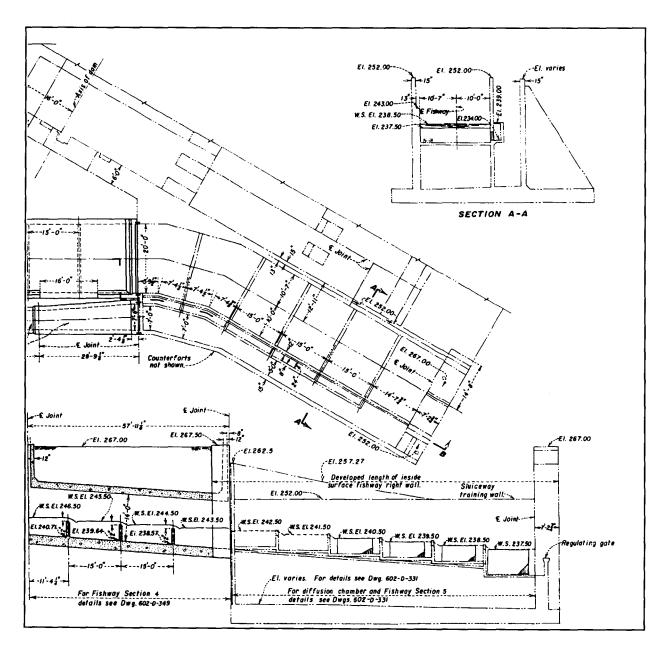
Plan and elevation details of the right abutment fish ladder.
